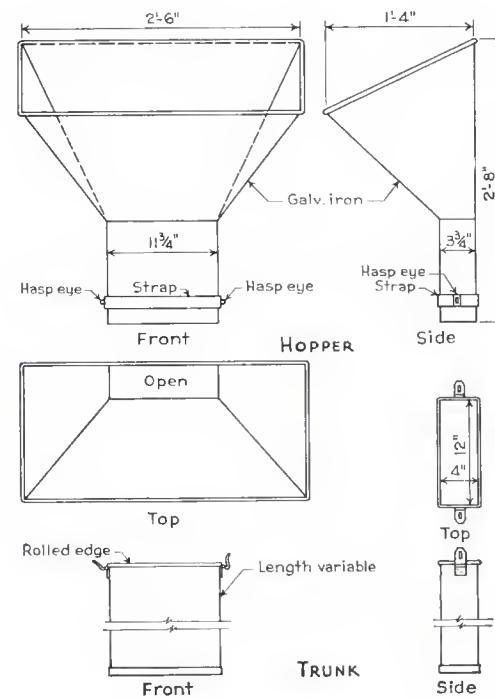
A rectangular drop chute with hopper at top for placing concrete in narrow walls.
